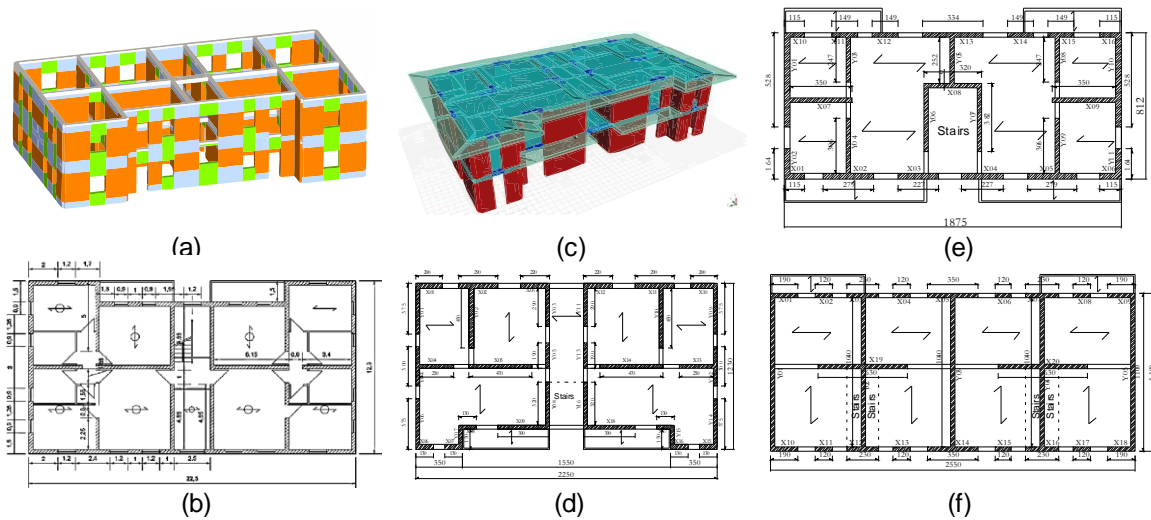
Examined URM buildings; (a) 3D view of the two-story C-type building (with equivalent frame model); (b) C-type plan; (c) 3D view of E-type building (with equivalent frame model); (d) E2 type plan; (e) E8 type plan; (f) E9 type plan.
